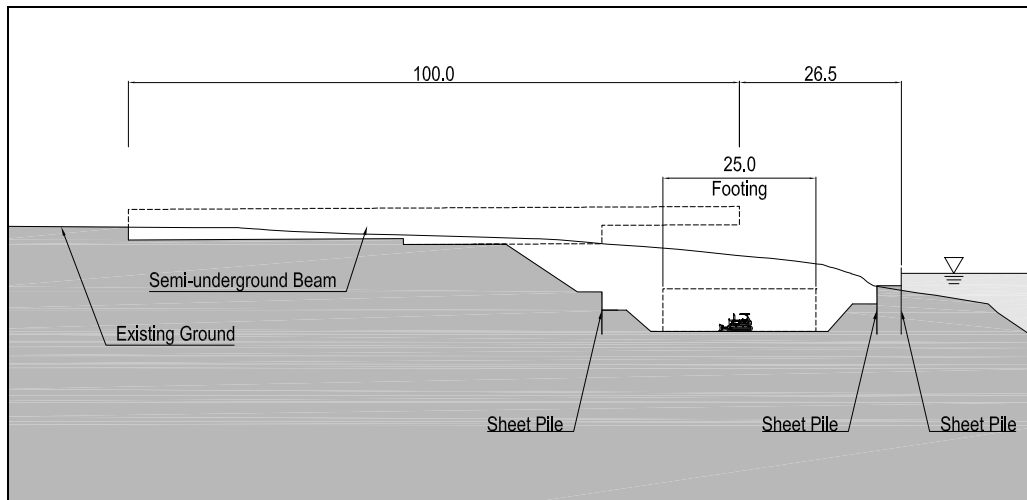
Method of Construction for the Foundation Works at the Njeru side
